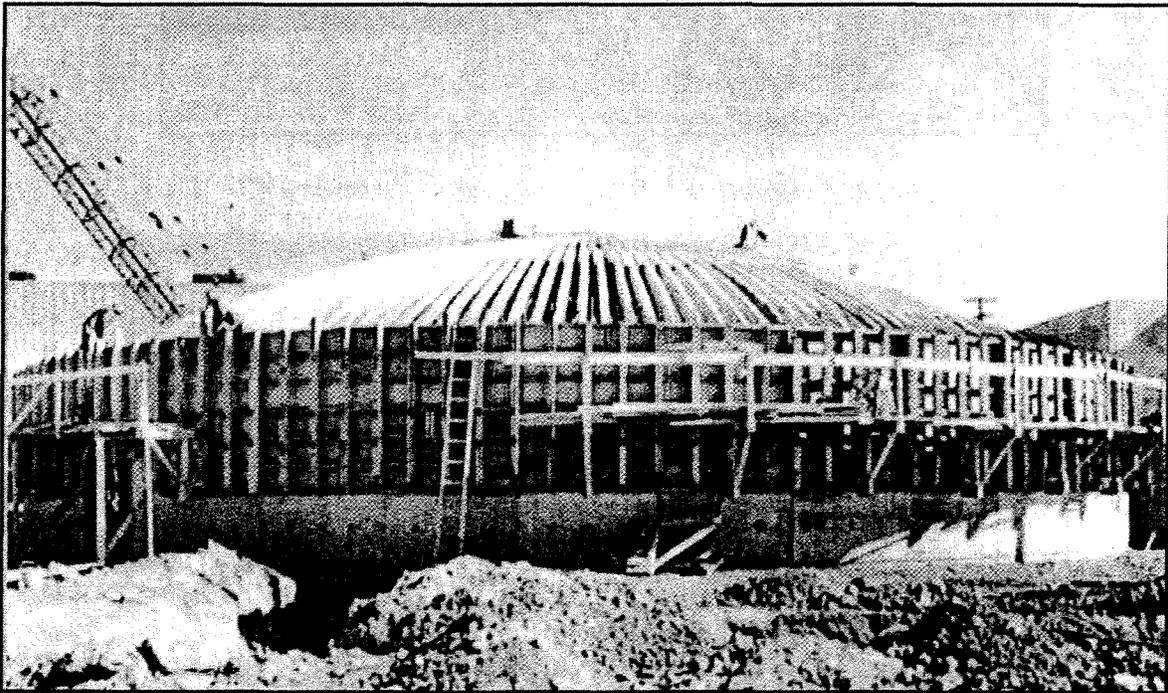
Construction of PGDP began in 1951. Building C-300 was designed as the plant's main control and operation facility.
